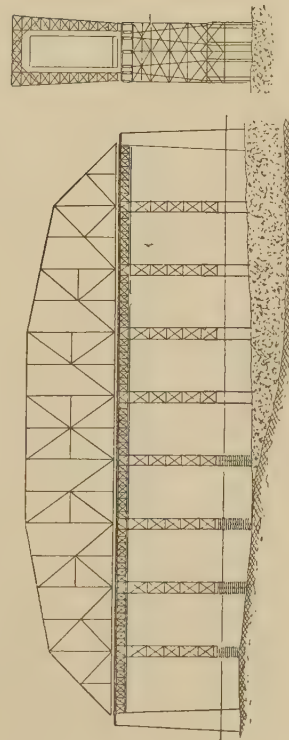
\*—FALSEWORK OF TOWERS AND HOWE TRUSSES.
